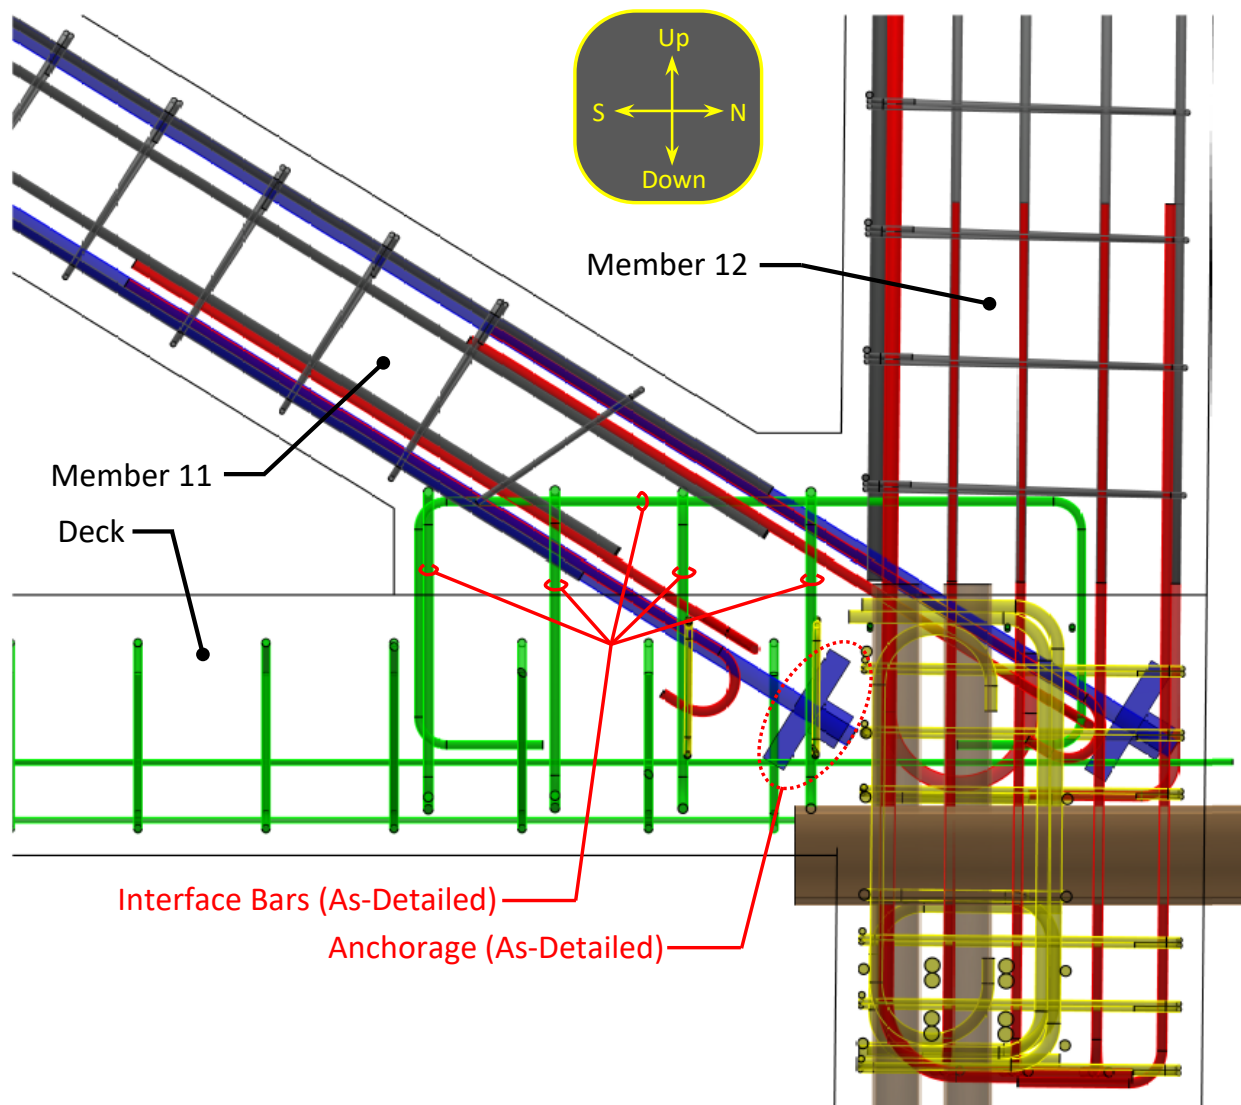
Illustration showing a rendering of the construction plans for the member 11 and 12 nodal region along the truss line of the bridge.
